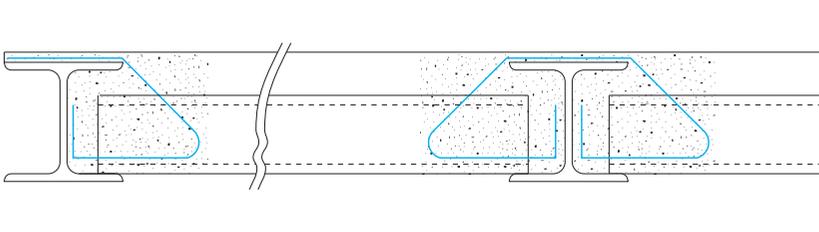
The hollow core floor placed on the bottom flange of the steel beam.
